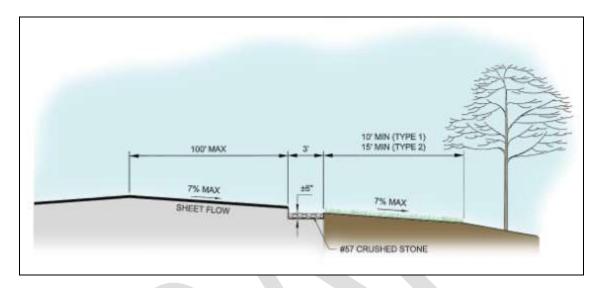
Schematic Cross Section of a Disconnected Paved Area (Freeman, Withers & Ravenel)
